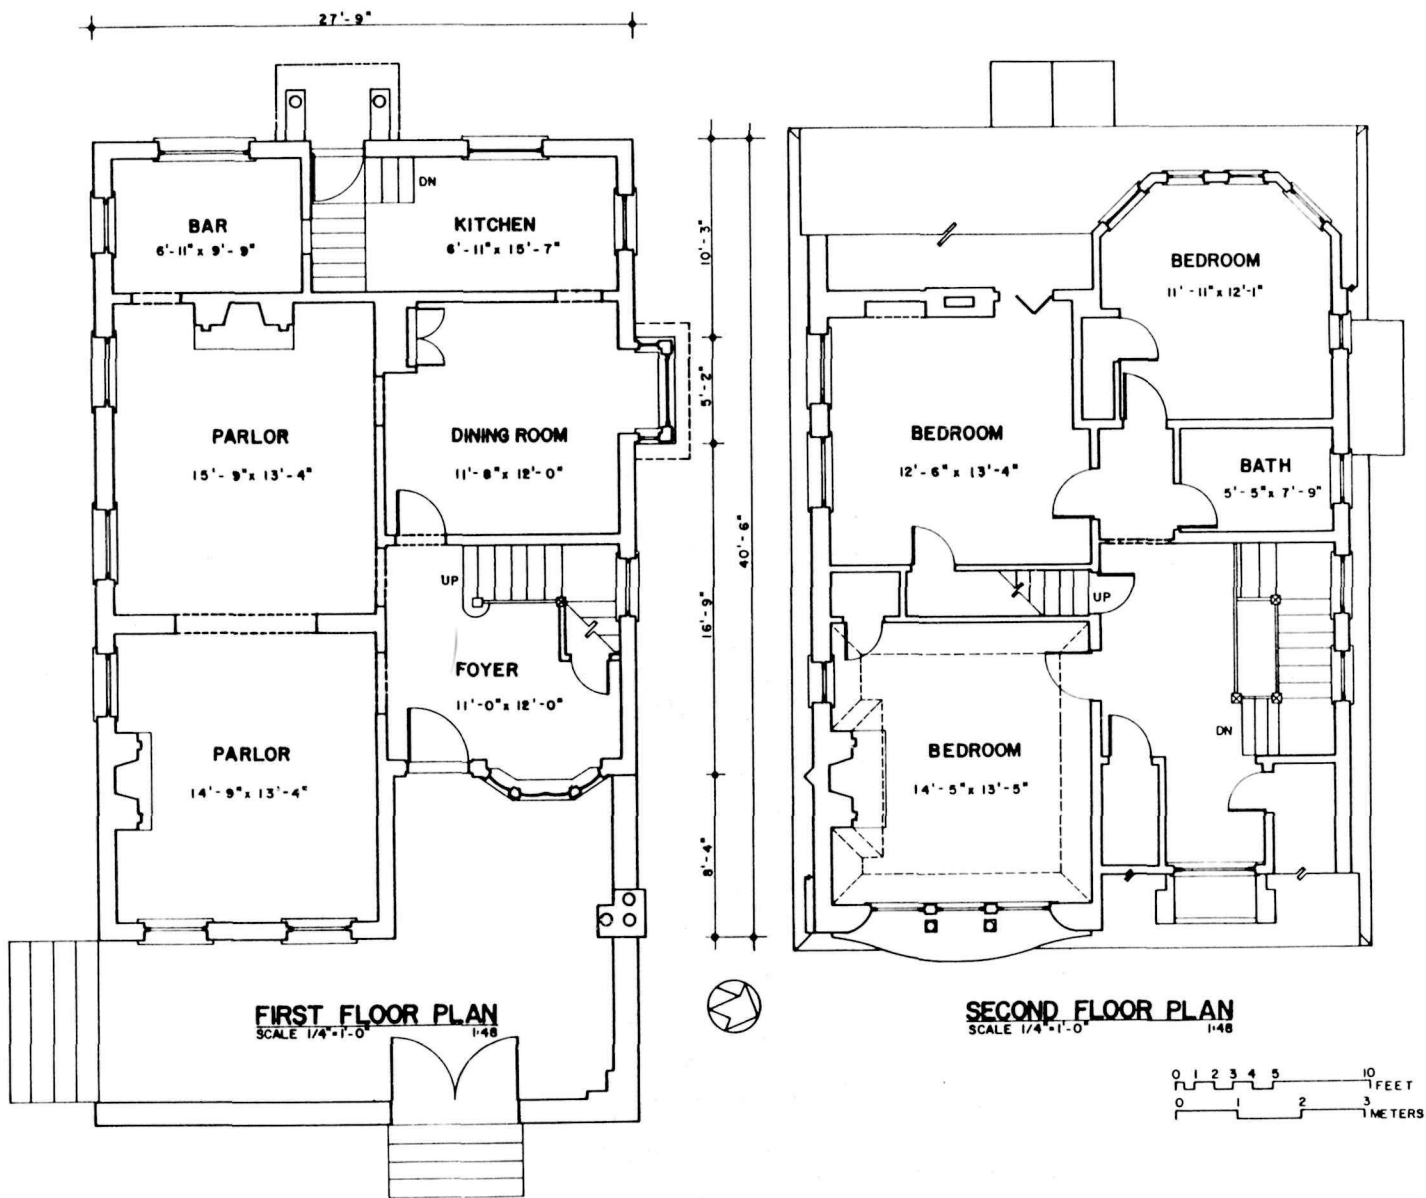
First- and second-floor plans, Michael J. Beezer House, 308 Logan Blvd., Lyswen. Drawn by David A. Macharola.
